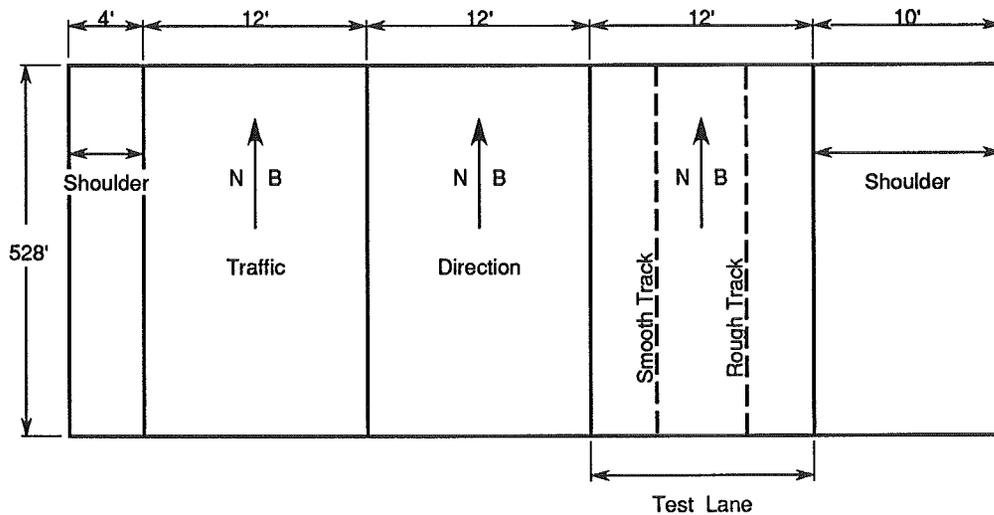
Test Section Location – SR101 @ MP. 15.4 (Construction Station 846+50 – 851+78)
